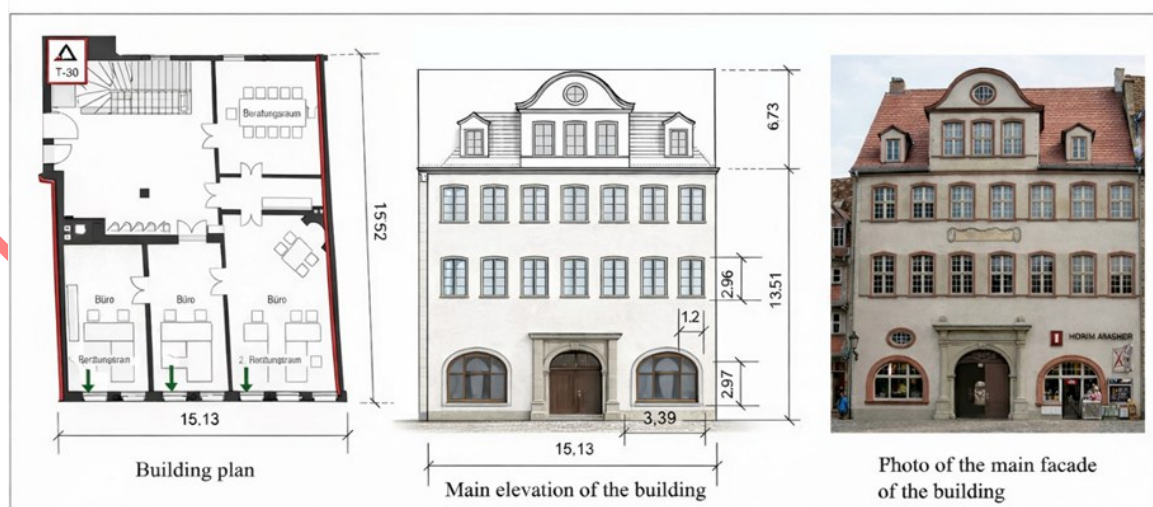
Geometric plan, main elevation and photograph of the façade of the real building.
